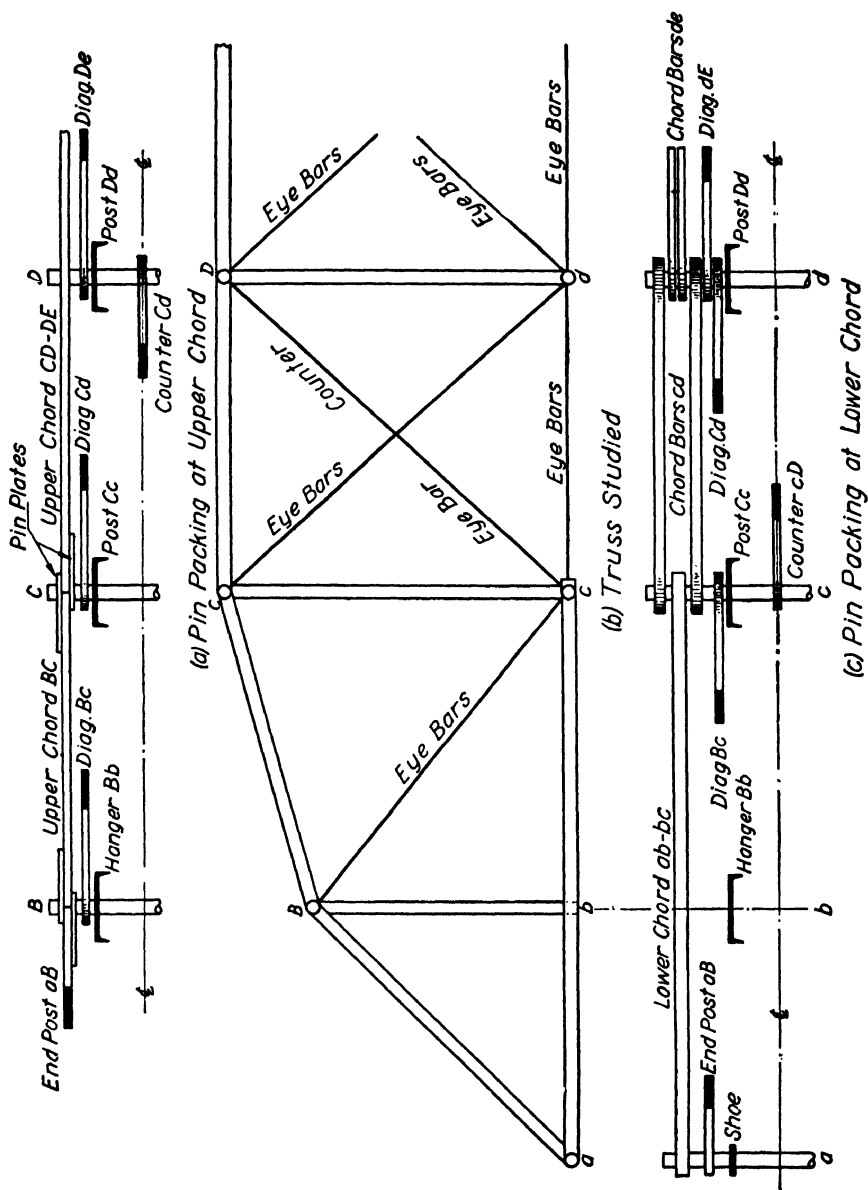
PIN PACKING FOR A BRIDGE TRUSS OF PRATT TYPE.
